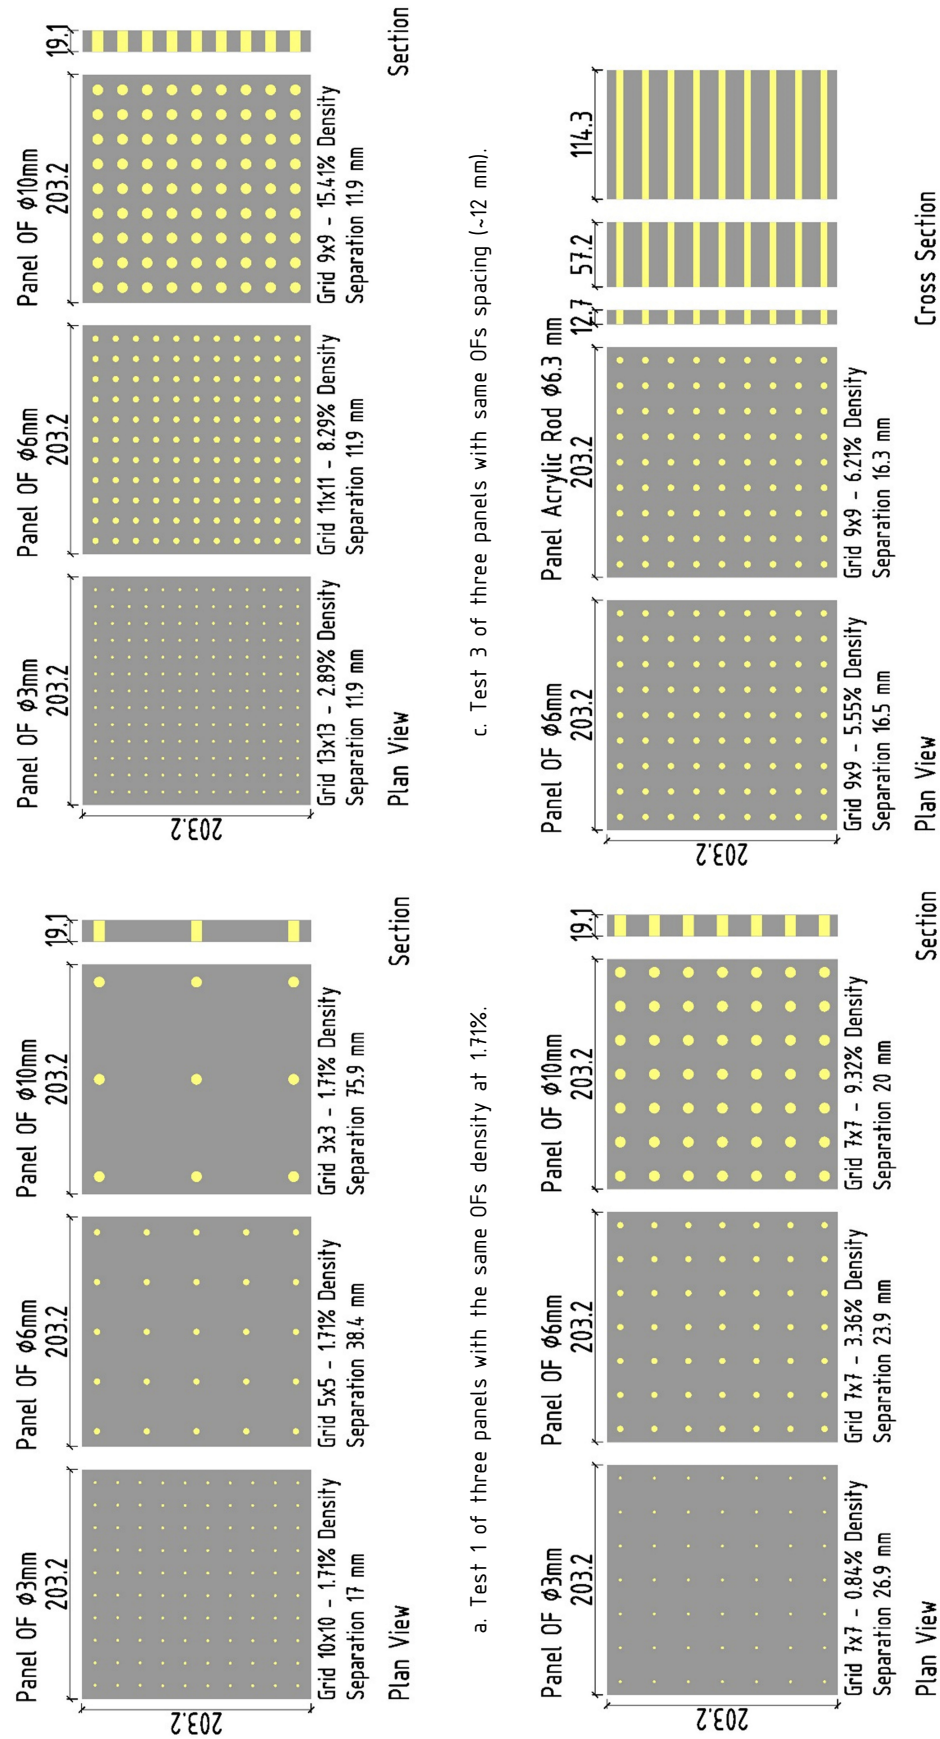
Overall Layer (B) test panels design. [Dimensions are in millimeters.]
